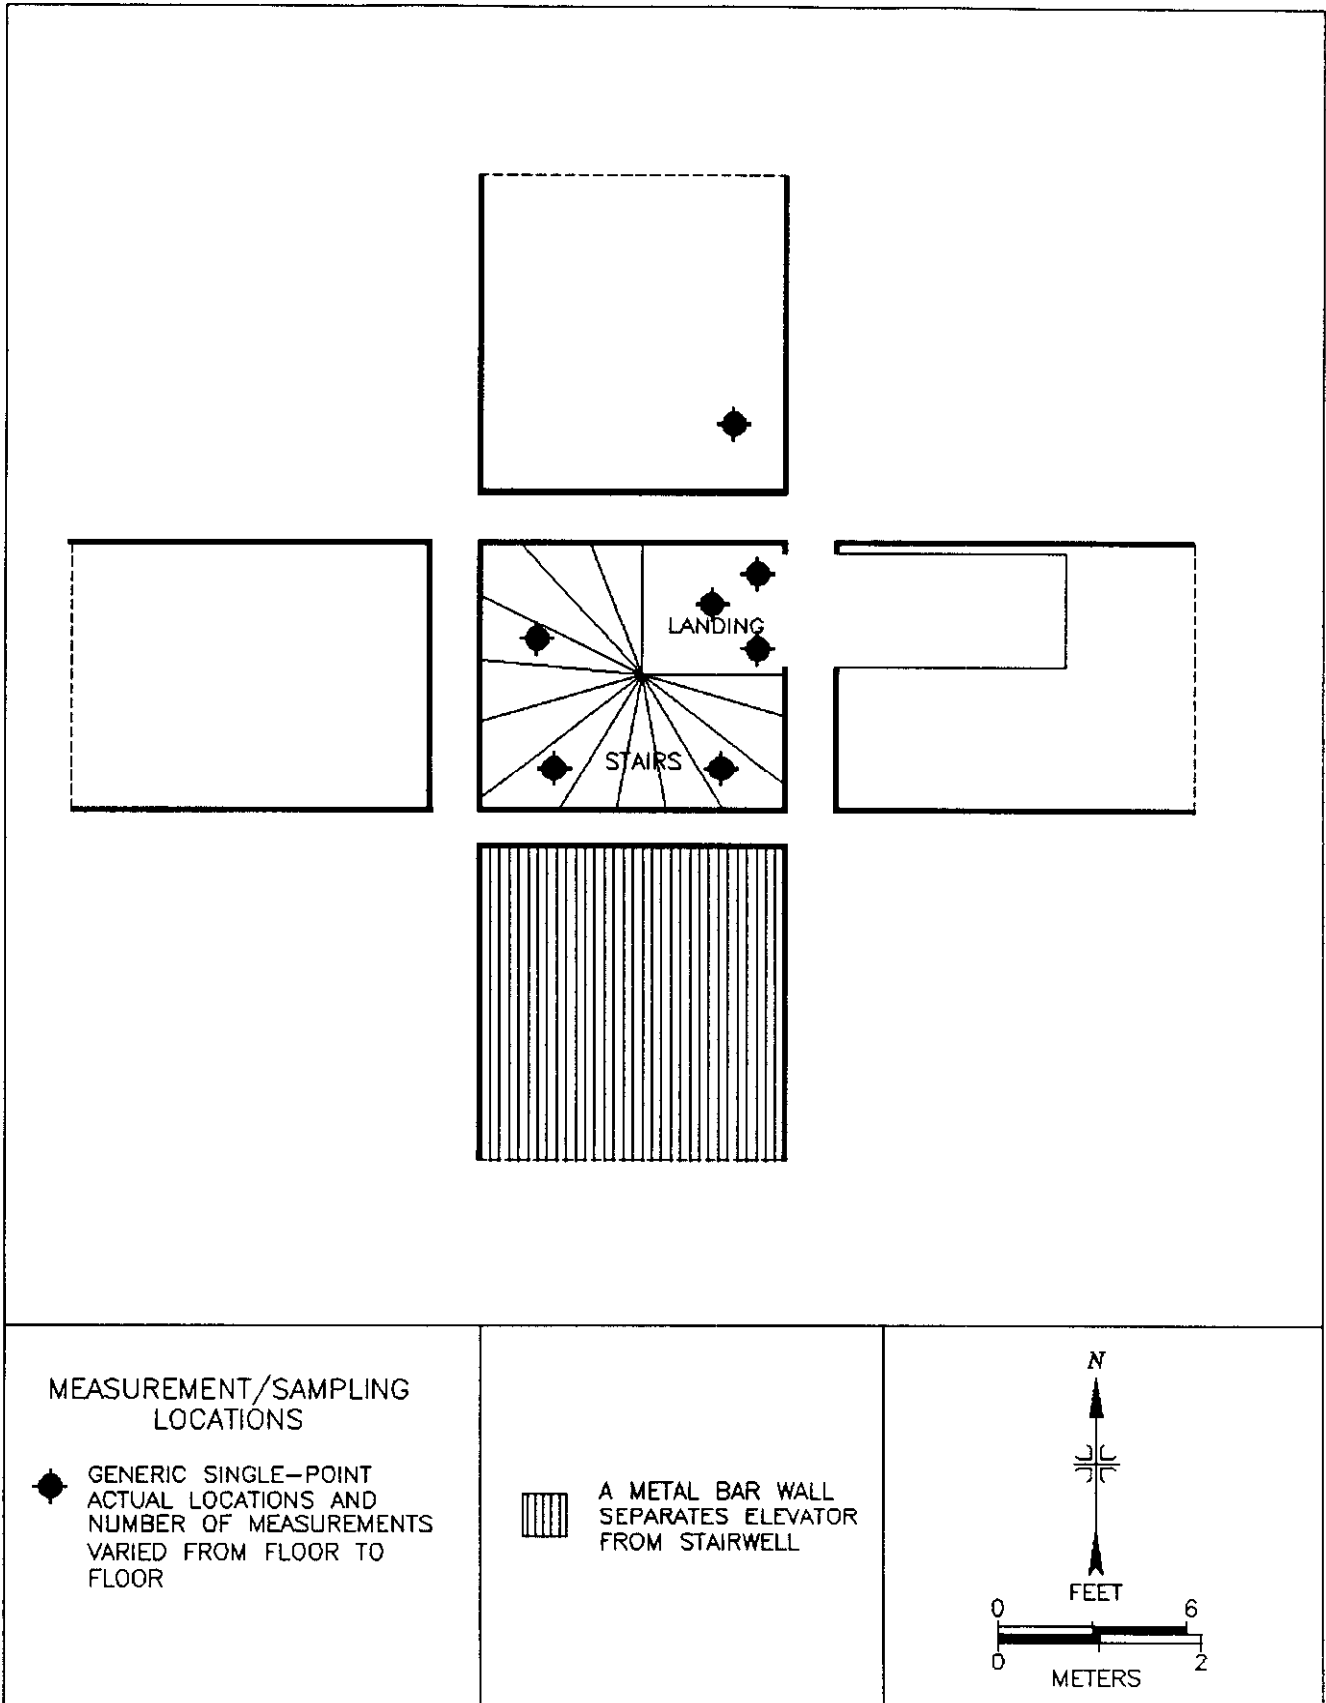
Stairwell, East Bay – Measurement and Sampling Locations
